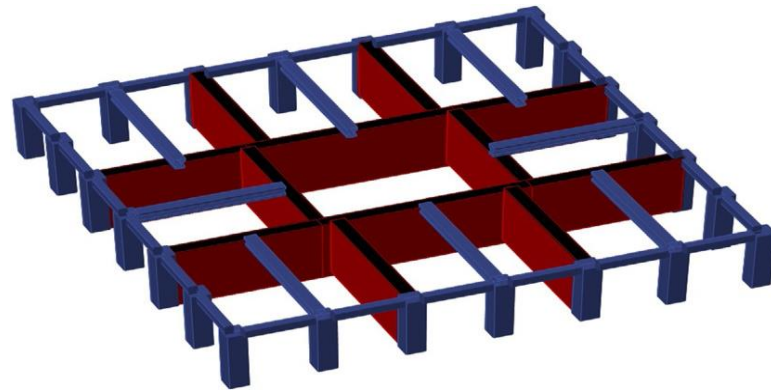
A typical outrigger using concrete wall modeled using ETABS.
